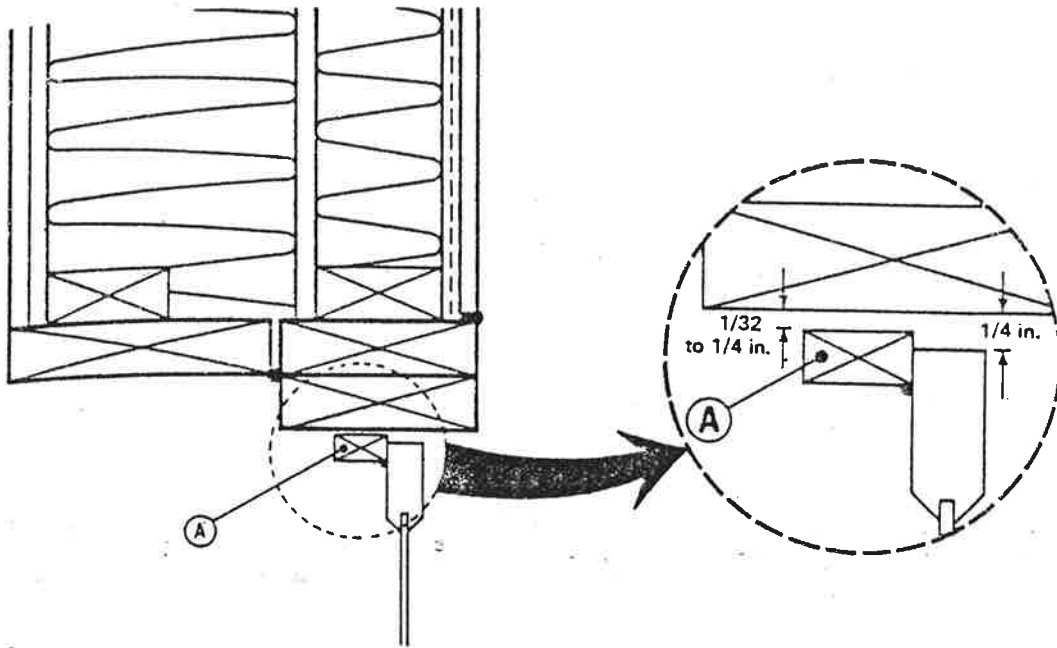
Detail of framing in filler wall to receive picture window sashes. Strip A was shimmed out to provide perimeter cracks ranging from 1/32 to 1/4 in. (Illustration from Ref. 10.)
